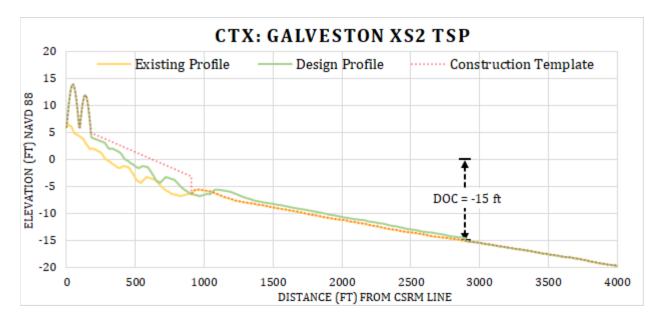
Galveston XS2 TSP; Construction template volume = 11.9 cyd/ft, top elev. at +5', slope at 1:90
